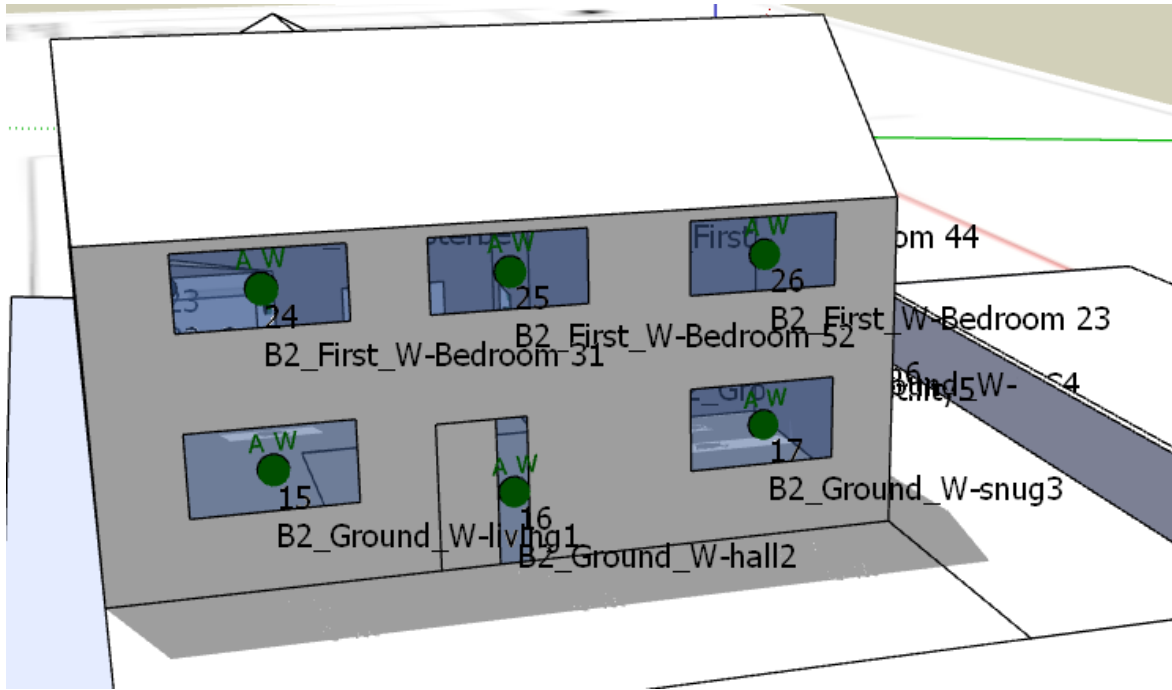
Surrounding Buildings B2 window references to be assessed (12 St Michaels Mount)
